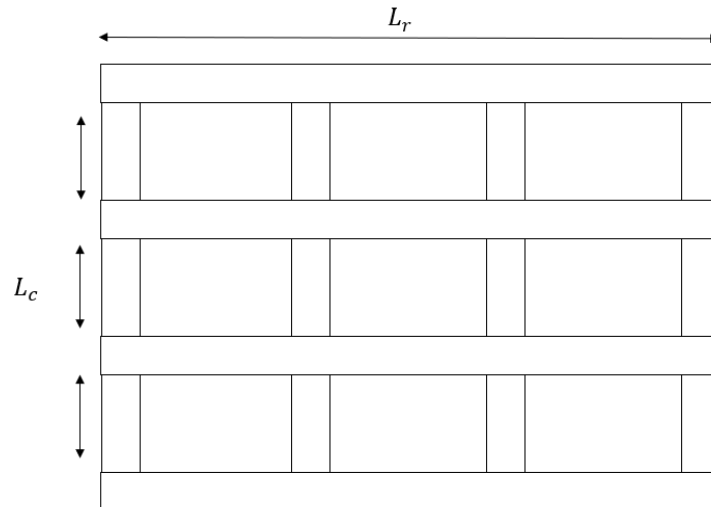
Frame layout for frame area calculations. The rows are shown to run the entire span whereas the columns are interrupted by the rows to avoid double counting the area.
